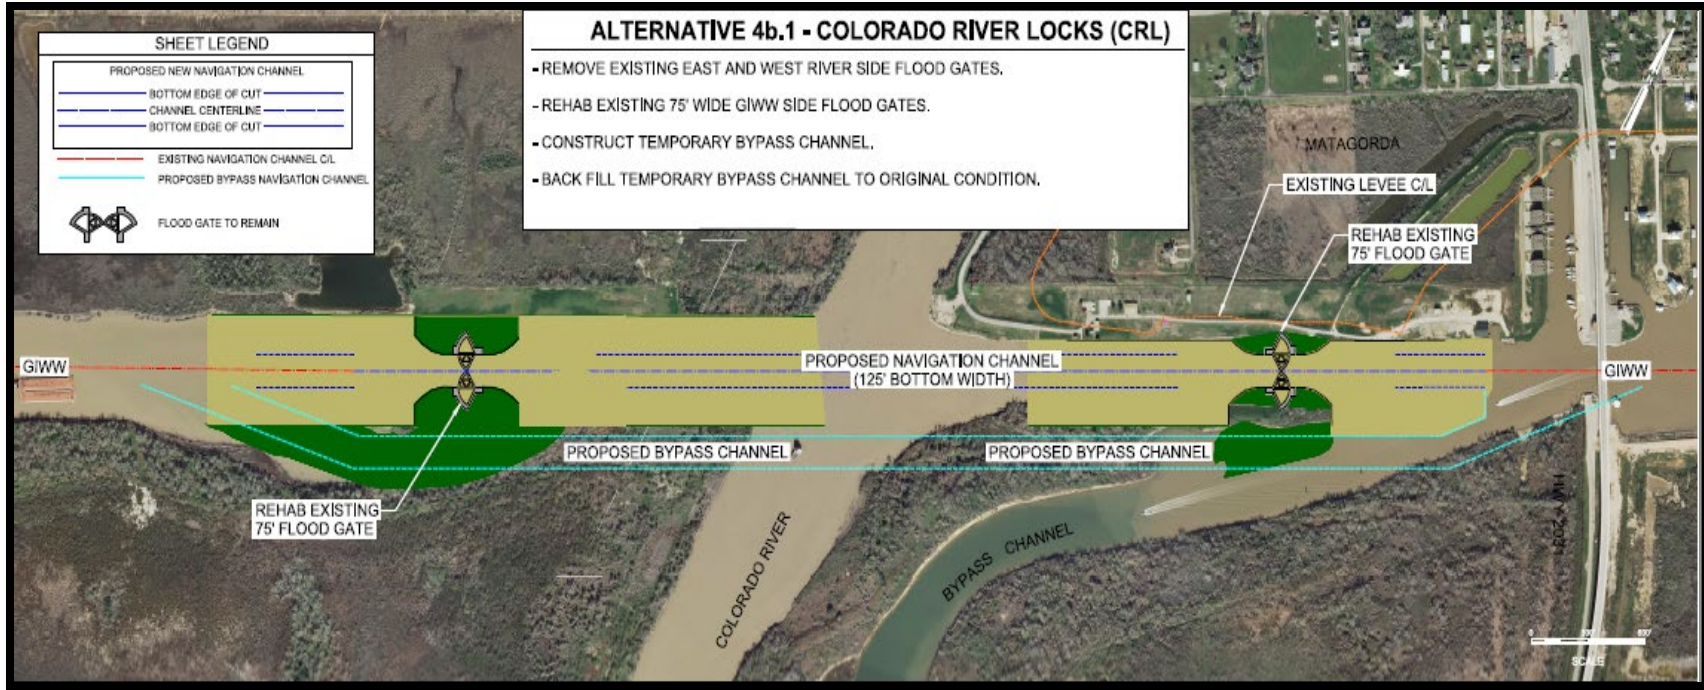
CRL Component of TSP Plan – Alternative 4b.1
